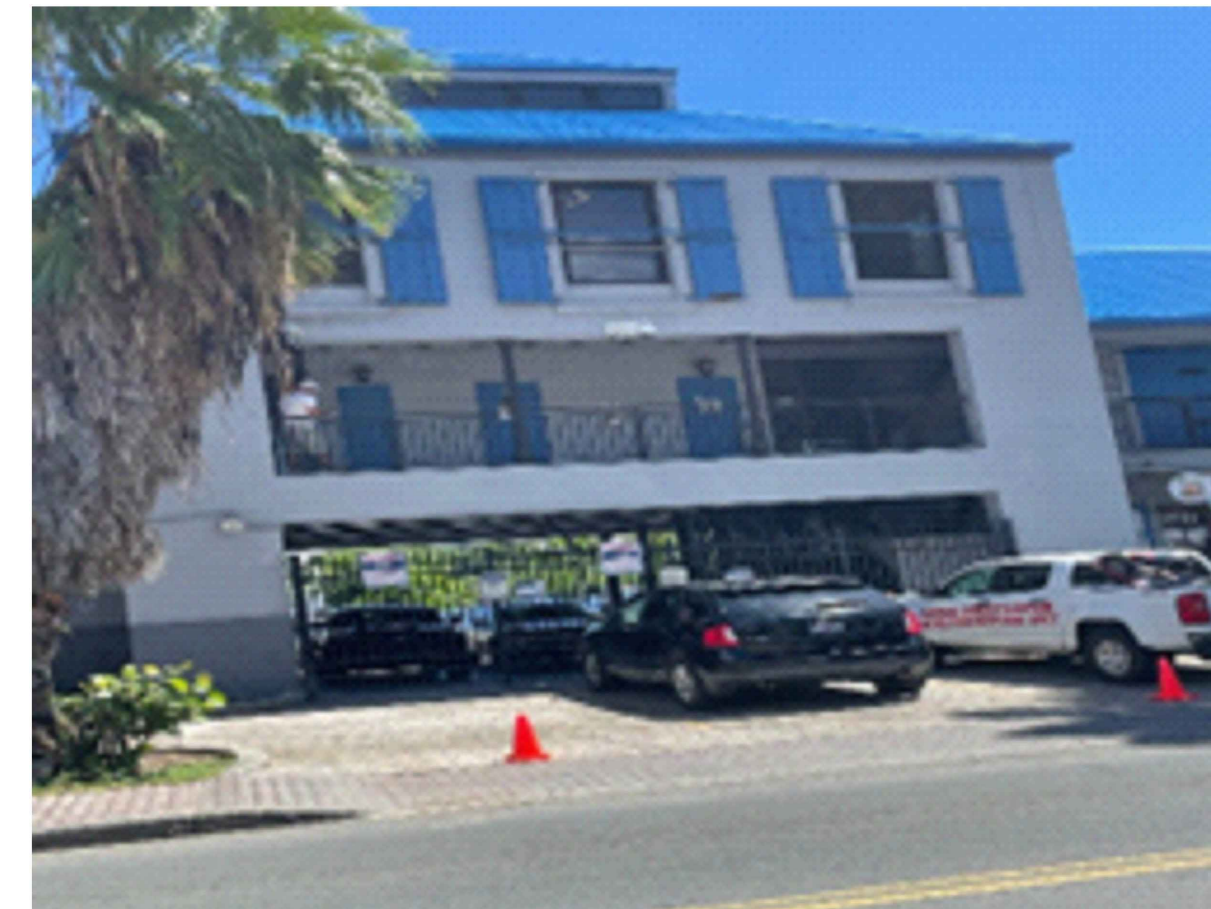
VIEW OF NORTH SIDE OF CENTRAL OPEN AREA ON 1ST FLOOR - BUILDING A
